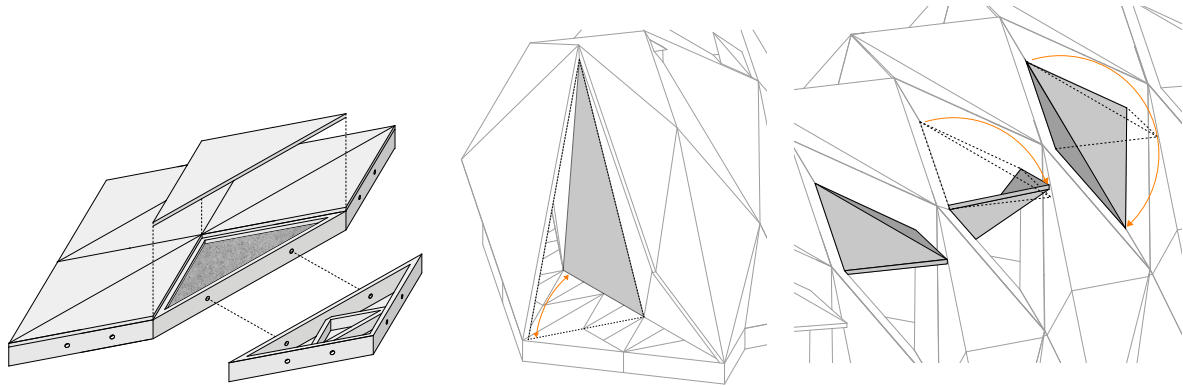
Connectable floor tiles, door fragment & window fragment
